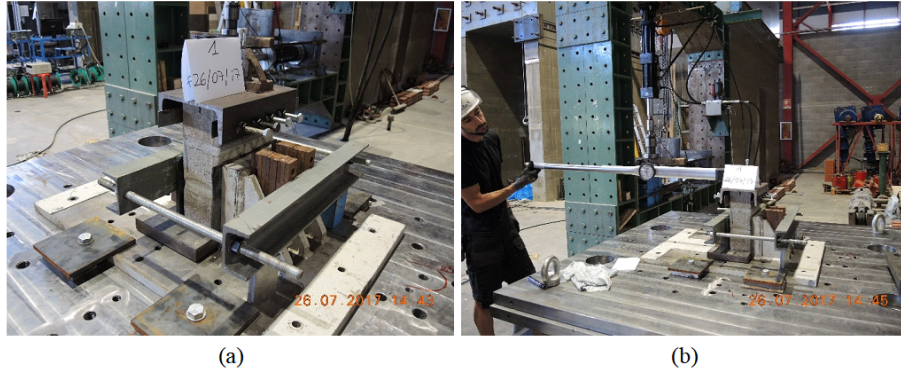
Bond wrench testing: (a) example of concrete-mortar test specimen and (b) apparatus for base clamping and application of loads
